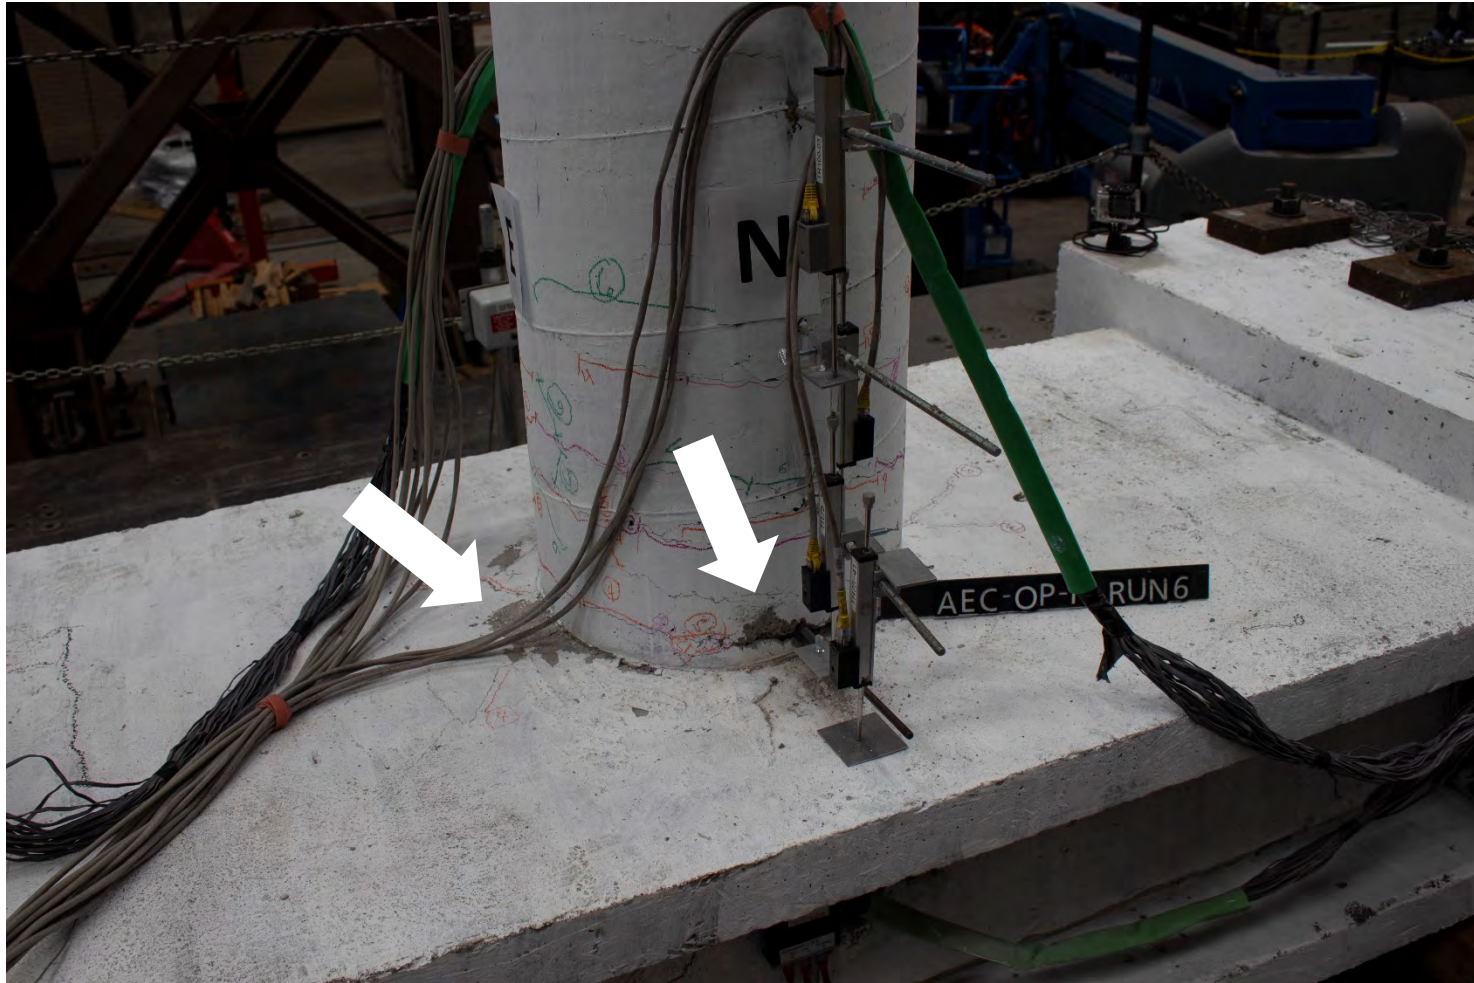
Spalling on the north side and cap beam (run #6)
